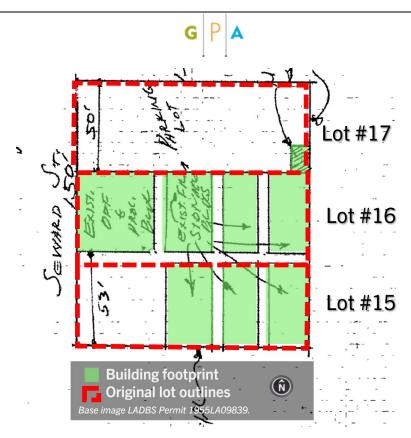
Plot plan from LADBS Permit No. 1955LA049839 showing the footprints of buildings constructed between 1951 and 1955.
